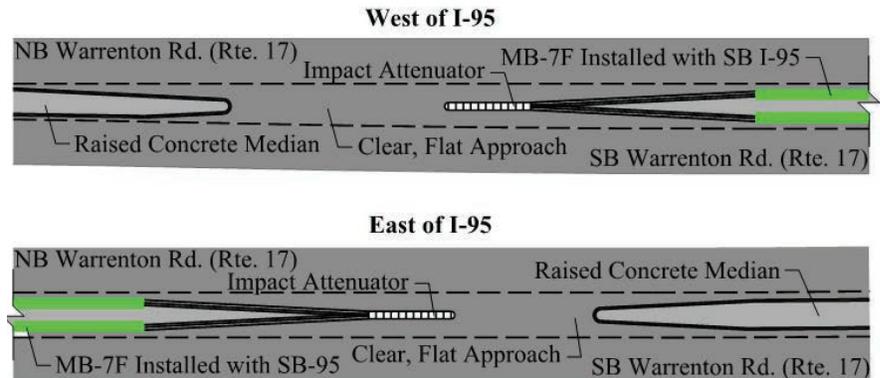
Transition from BPPS to Raised Concrete Median on Route 17
